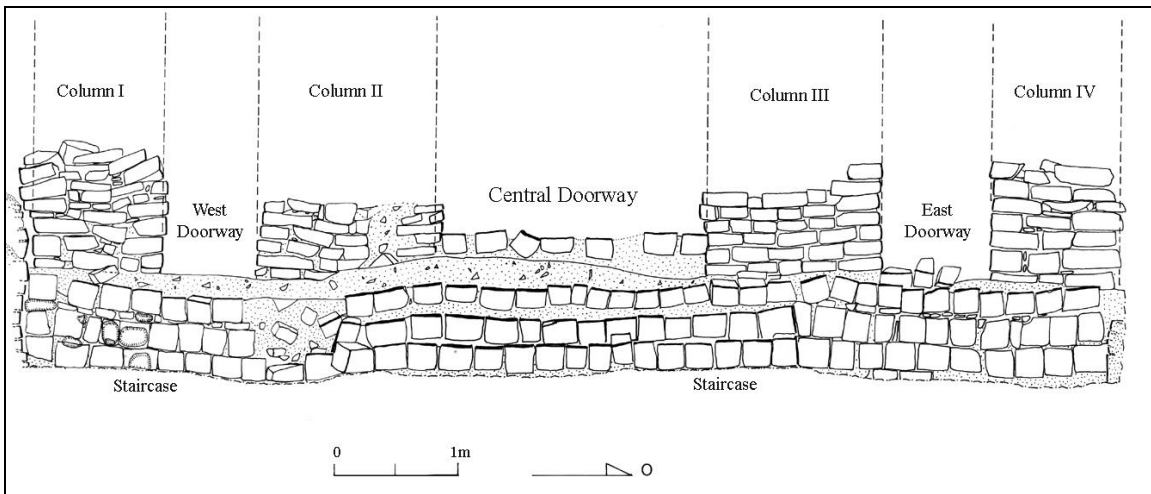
South elevation, Structure L7-1 (Drawing by L. Luin, VCAP)
